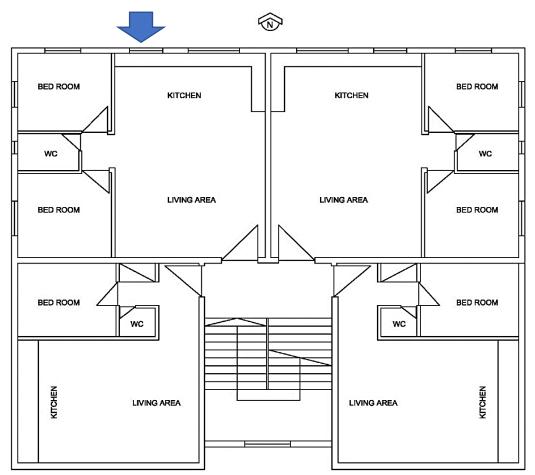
The Case Study Architectural Plan (Source: Author)
